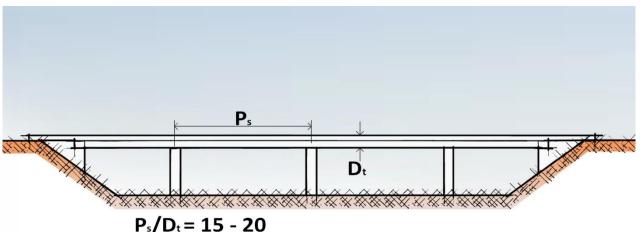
Ideal slenderness ratio for pier and girder bridges
